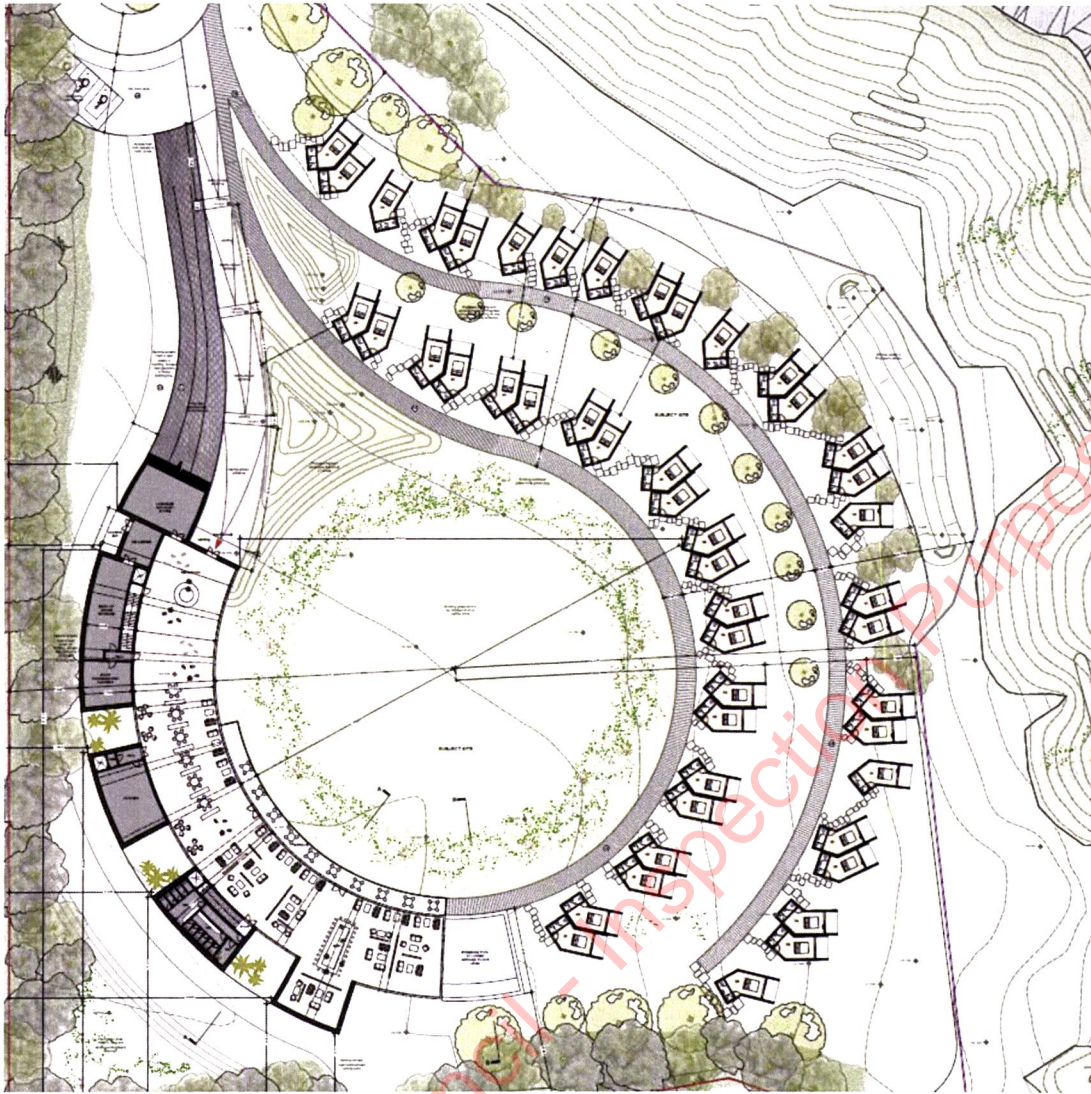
Ground Floor Layout Plan, main building and accommodation pods
